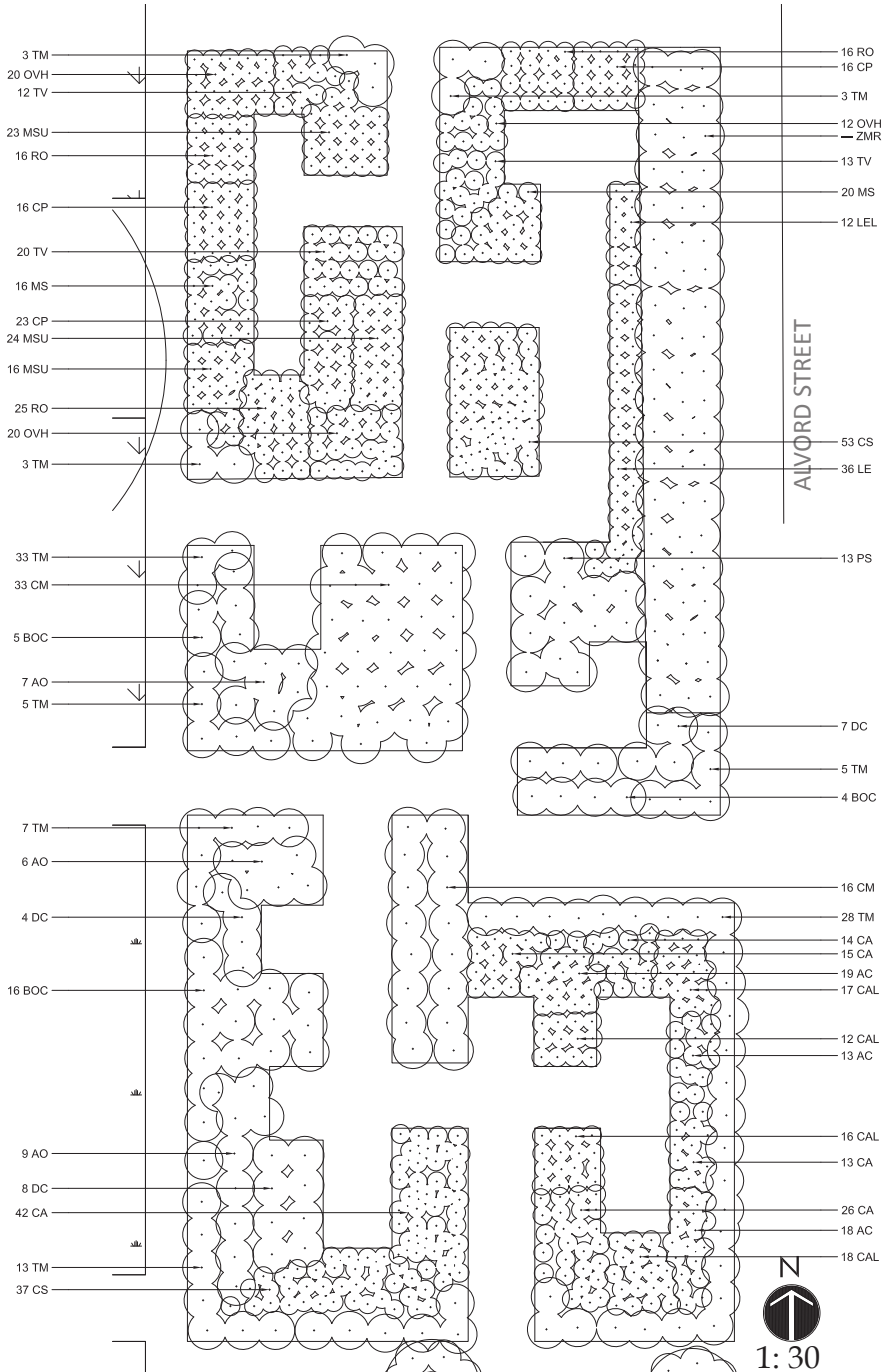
| HORTICULTURE GARDEN PLANTING PLAN
